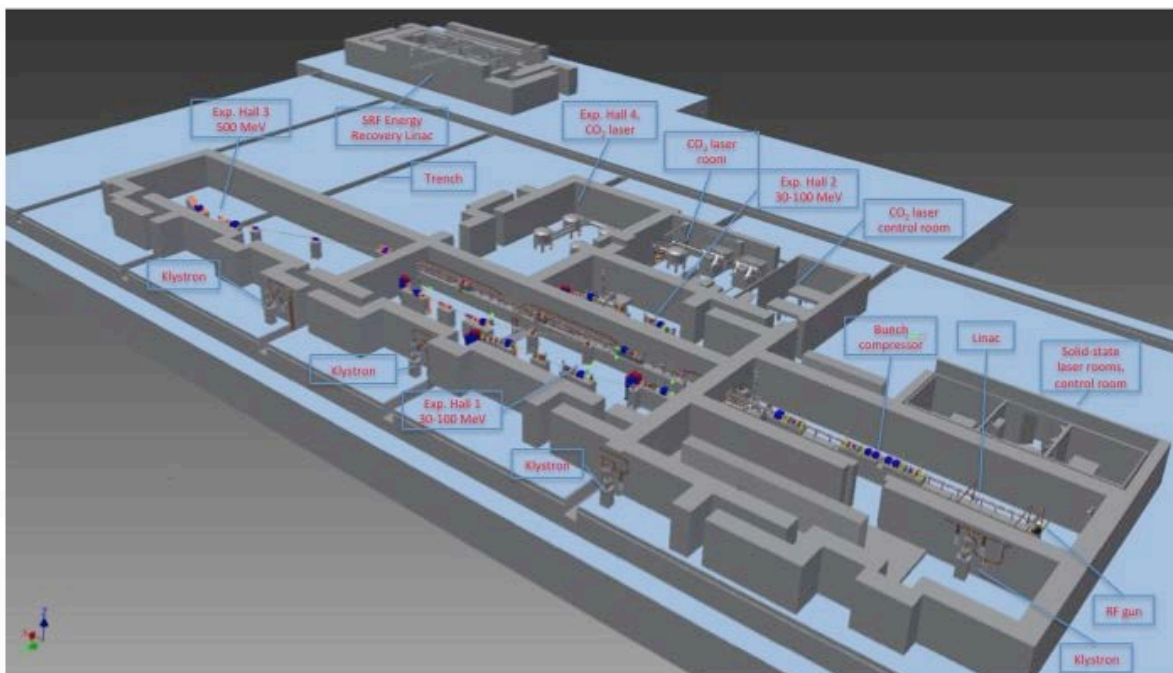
A 3D Model of the proposed facility, laid out in Building 912, with major components labeled. The facility is placed on top of large concrete slabs separated by trenches. Shielding blocks and the roof are made of concrete and are positioned by an overhead 40 ton crane. The roof shielding can be removed and replaced to insert and remove very large equipment.
